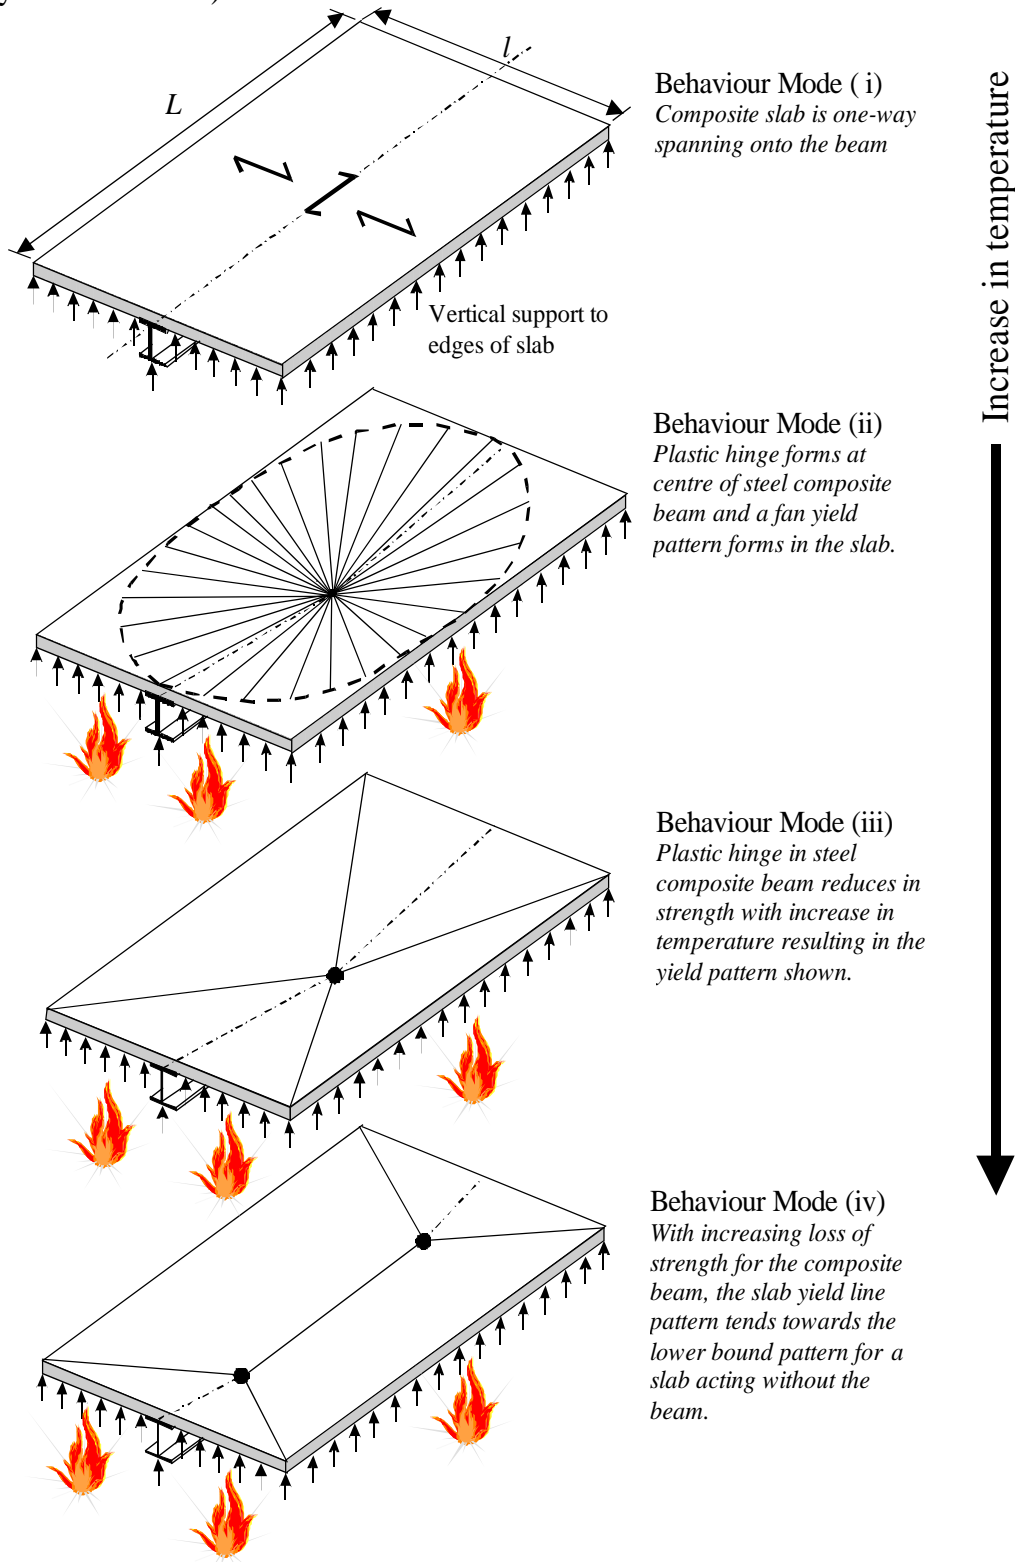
Yield line pattern for slab with heated supporting steel beam
